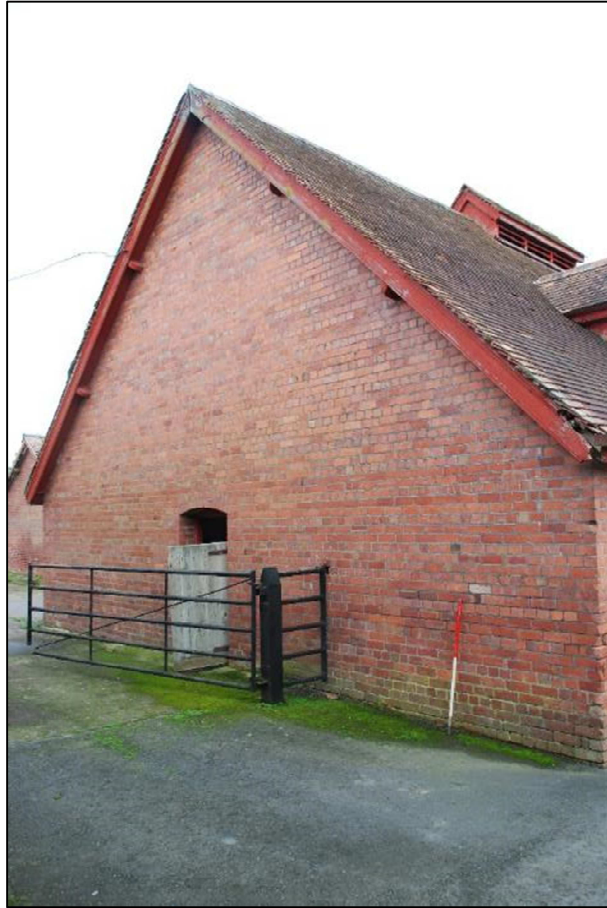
(Shot 29): West facing elevation of Building C, showing gateway which connects to building D, looking northeast
